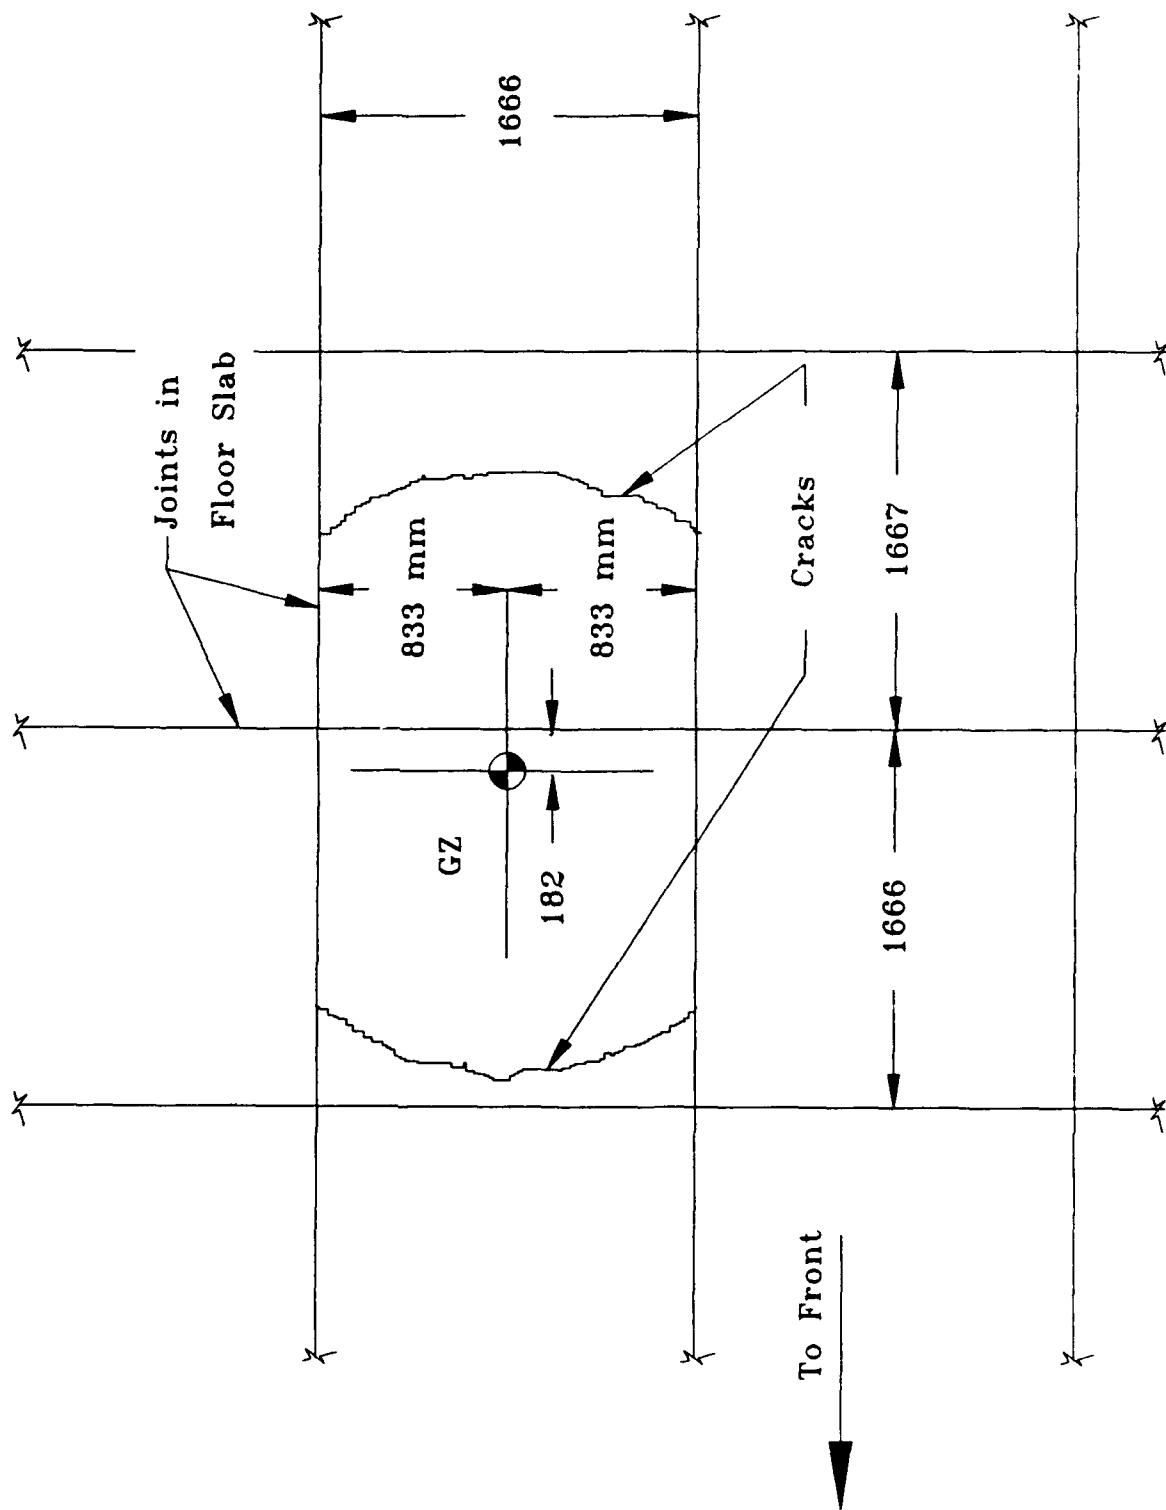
Crack pattern in floor slab, around GZ, PAS-1.
